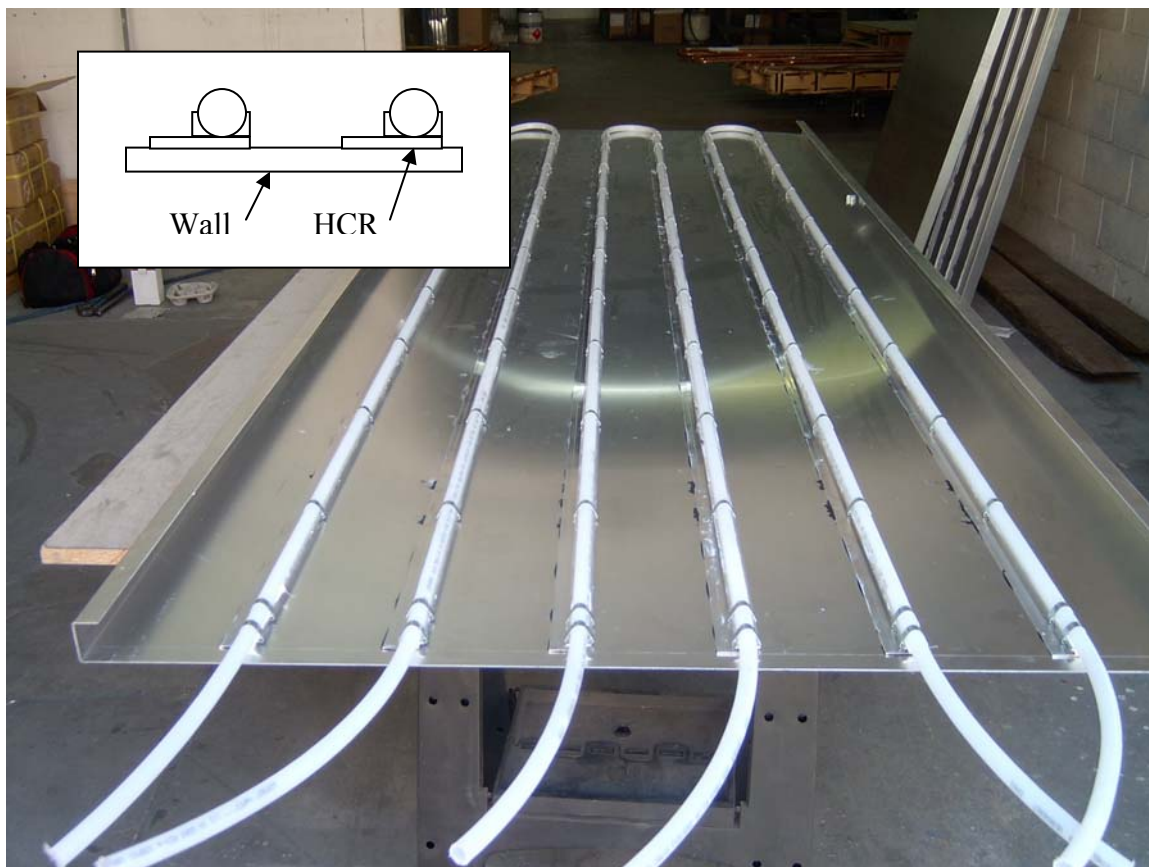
Test Booth Construction – Indoor View of Walls
